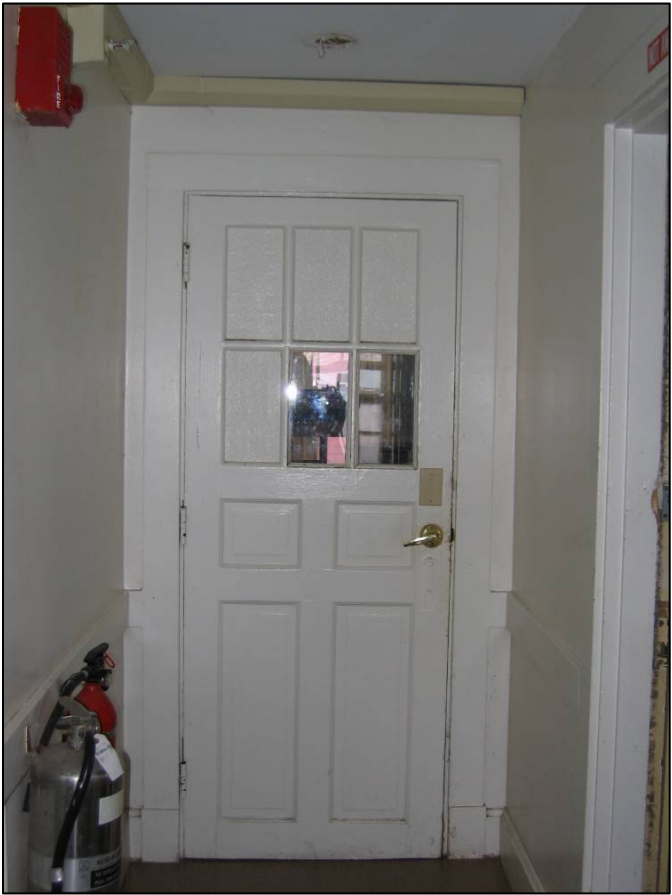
Room 201 (hall), south wall and doorway #2D.
